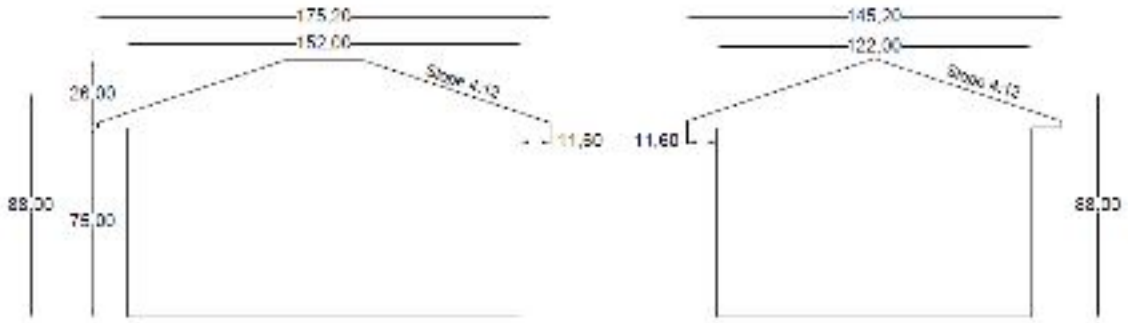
3: Model B layout (a) Elevation View (b) Side View (all dimensions are at model-scale in cm)
